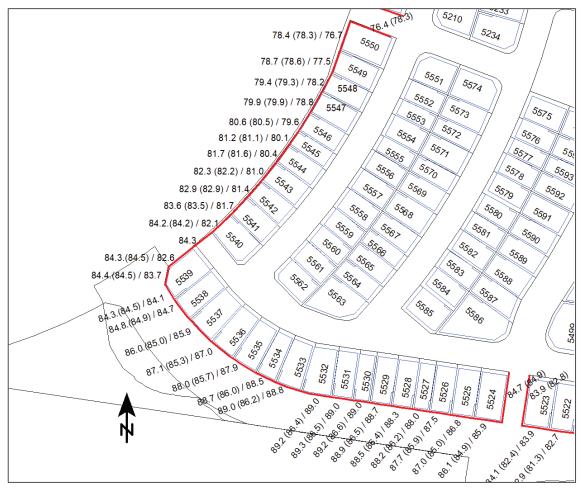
Noise Barrier Relative Elevations, m – Barrier Base (Dwelling Average) / Closest Road Lane
